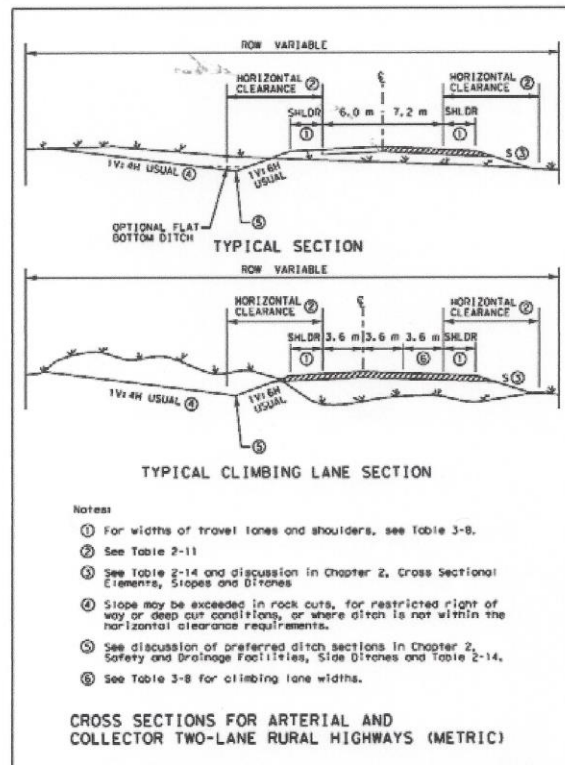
(M). Cross Sections for Arterial and Collector Two-Lane Rural Highways.
